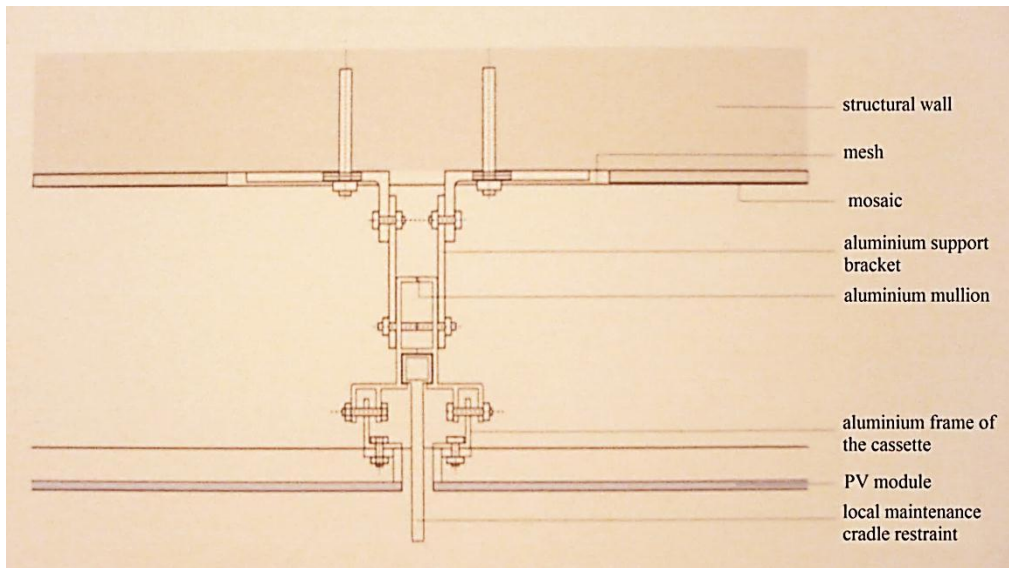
Cross-section of the bracket fixing system for attaching cassettes of PV modules to the wall of The Co-operative Insurance Tower (Robert and Guariento, 2009).
